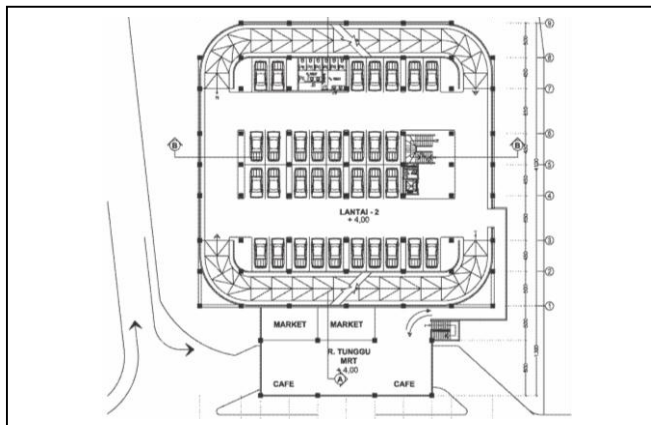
Park & Ride building’s typical floor plan on Meyjend Sungkono Street, Surabaya [1]
